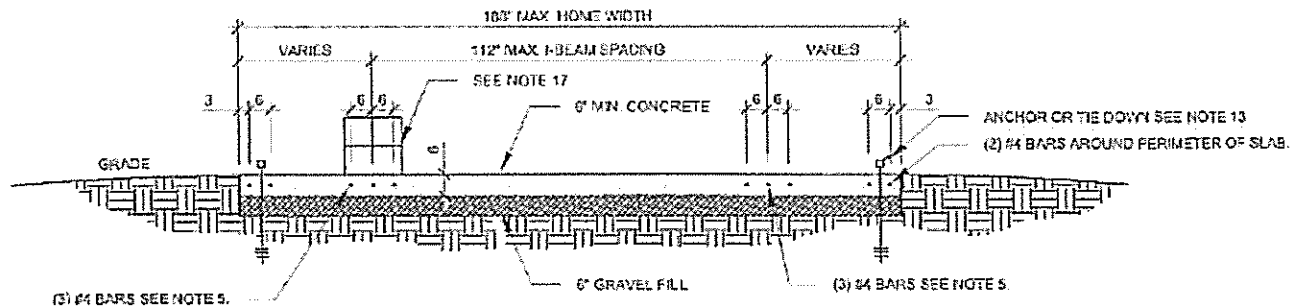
FFF installation detail for Example #4 (Monolithic Slab FFF)
